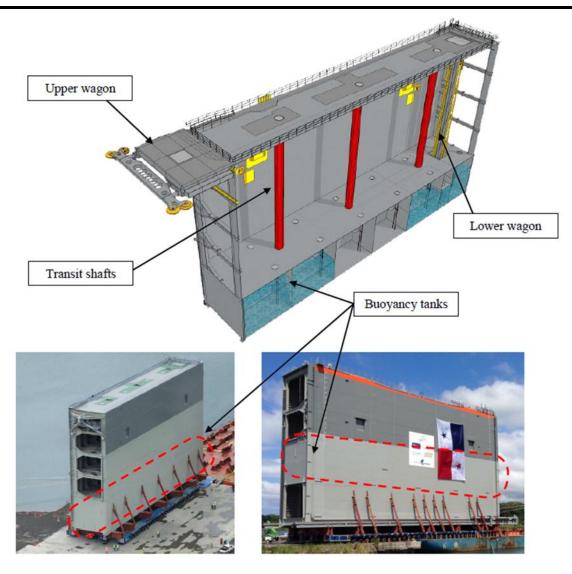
Wheelbarrow rolling gate system Panama Canal also showing buoyancy tanks and compression column (courtesy of Autoridad del Canal de Panamá)
